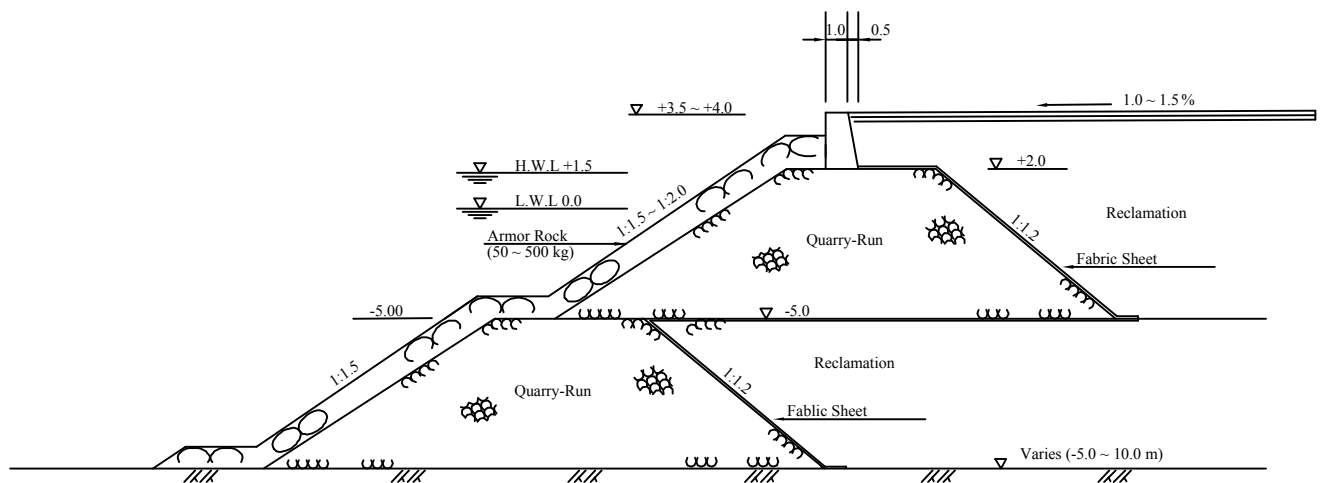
Typical Section of Exist. Wharf Improvement
